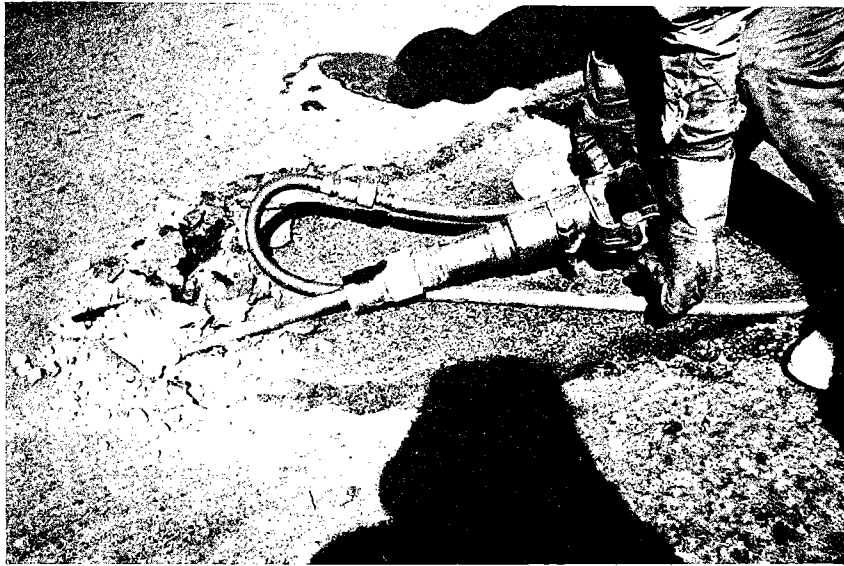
Excavation operation for repair of depression failure. Note failure occurred at periphery of existing patch. Two earlier patches are visible; an original patch and a previous peripheral patch.
